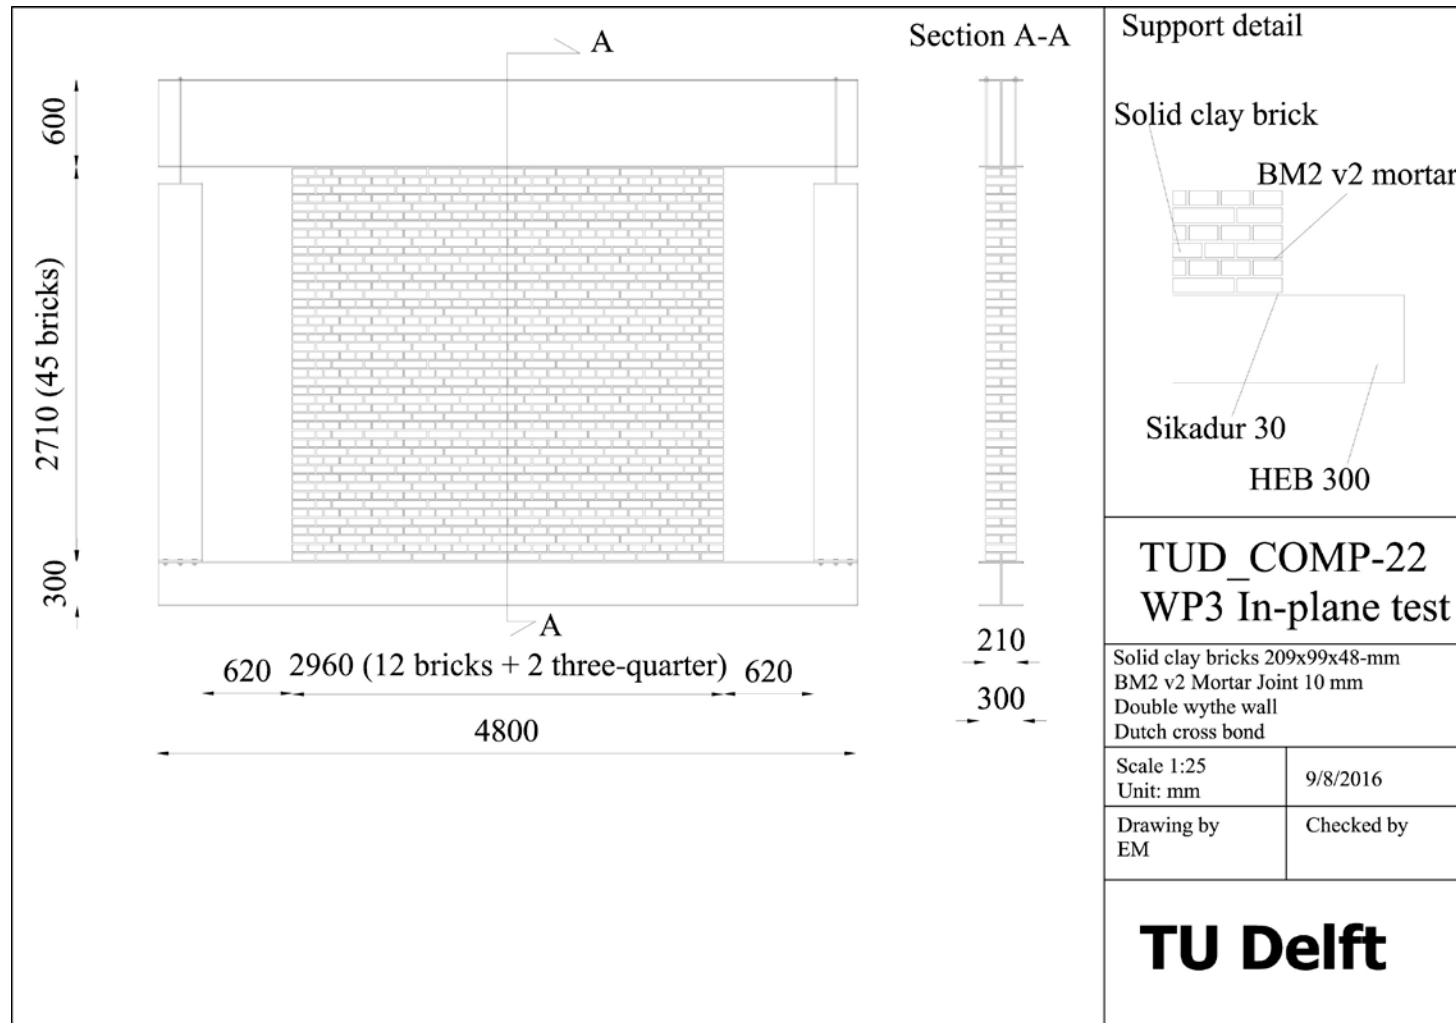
Drawing adopted for the construction of wall TUD_COMP-22. As built dimension in Table 19.
